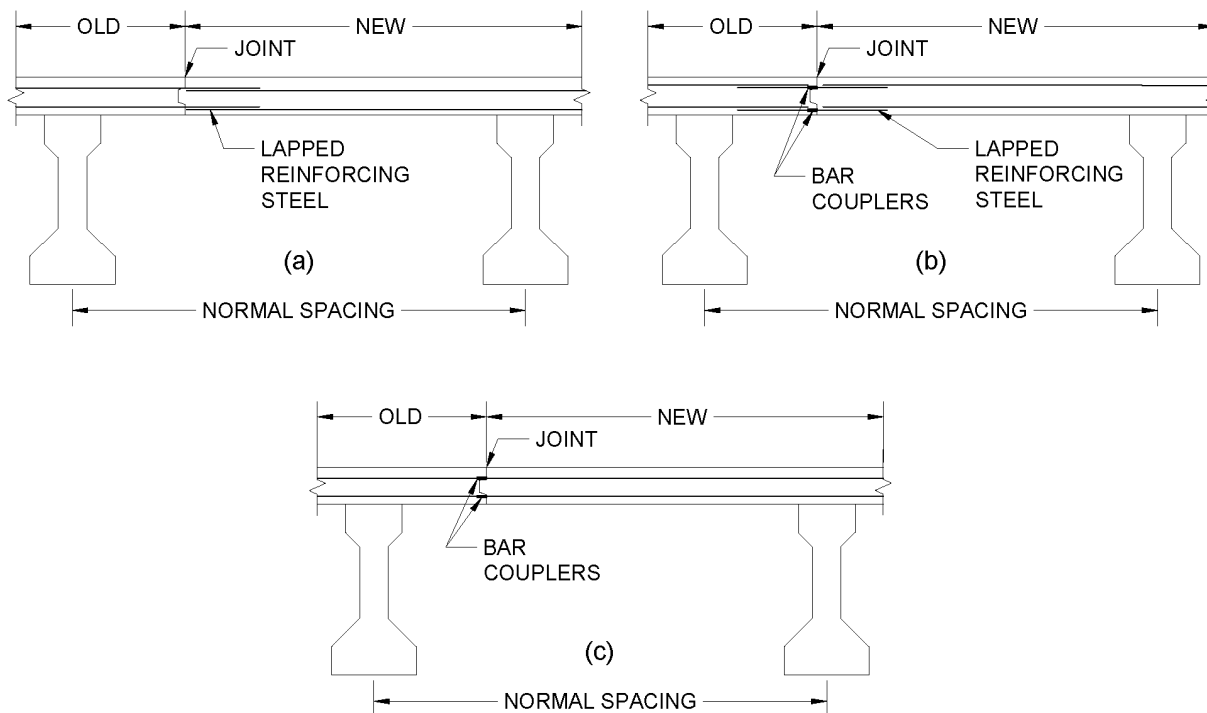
Longitudinal construction joint reinforcement details seen in Wisconsin.
